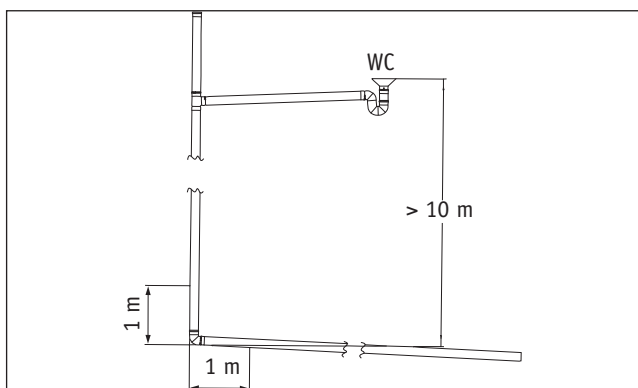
No sanitary units should be connected closer than 1 m from the change of direction from vertical to horizontal pipes if a toilet is connected more than 10 m above the change in direction.
